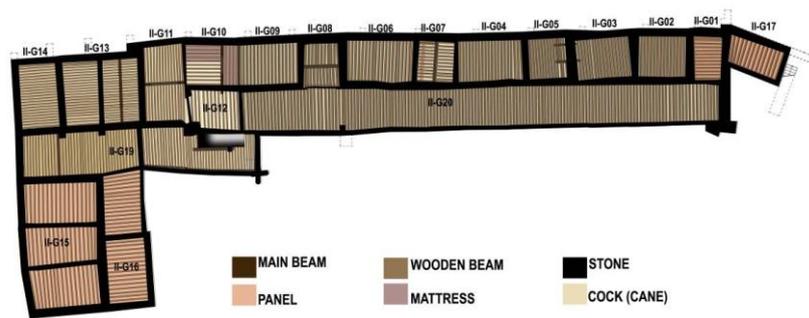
Survey drawing of the north wing building, ceiling plan of the ground floor
